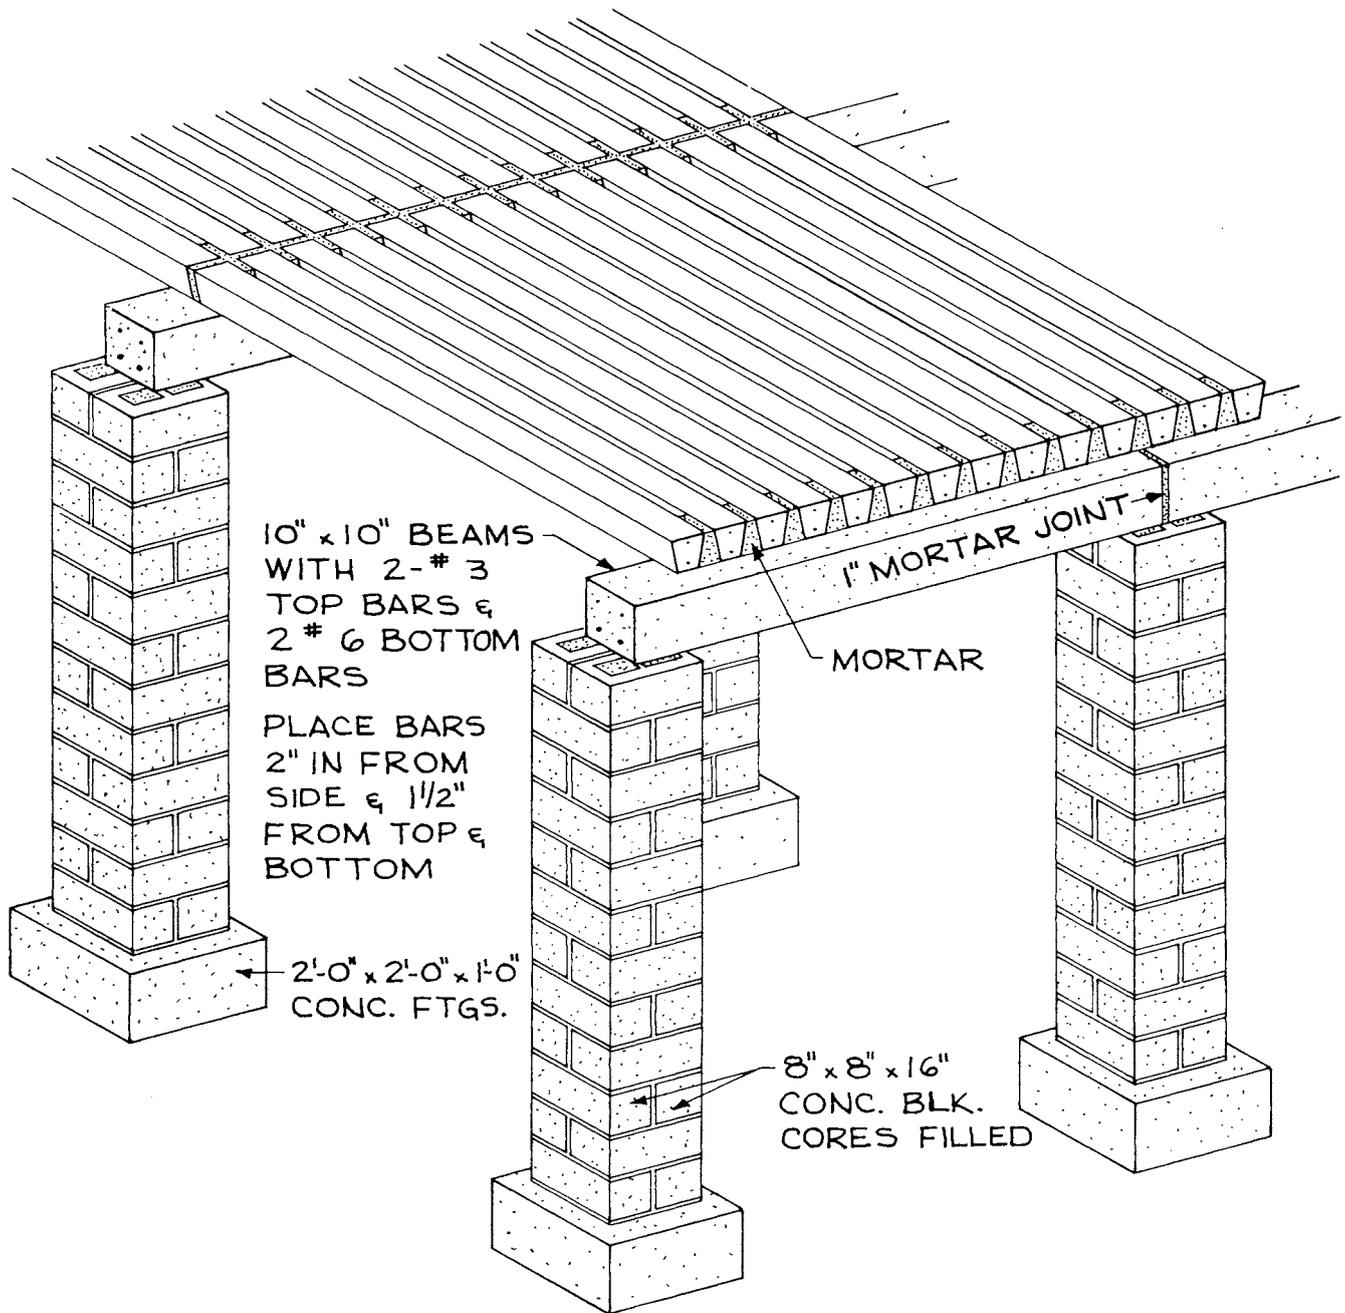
Details of faotings, columns, and beams to support slats in either a cold or warm building.
